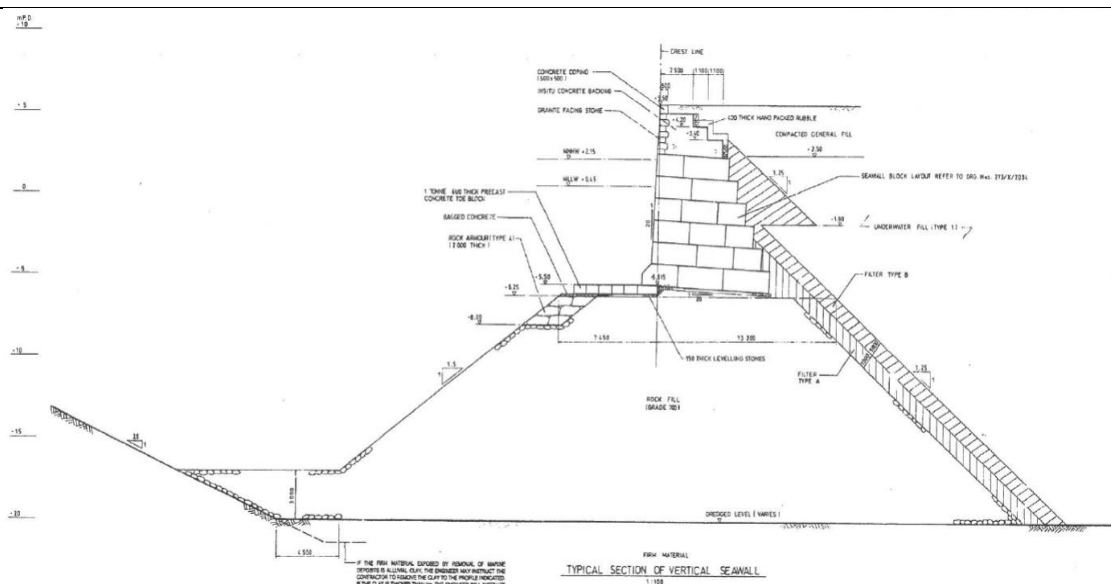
Typical Section of Existing Vertical Seawall
